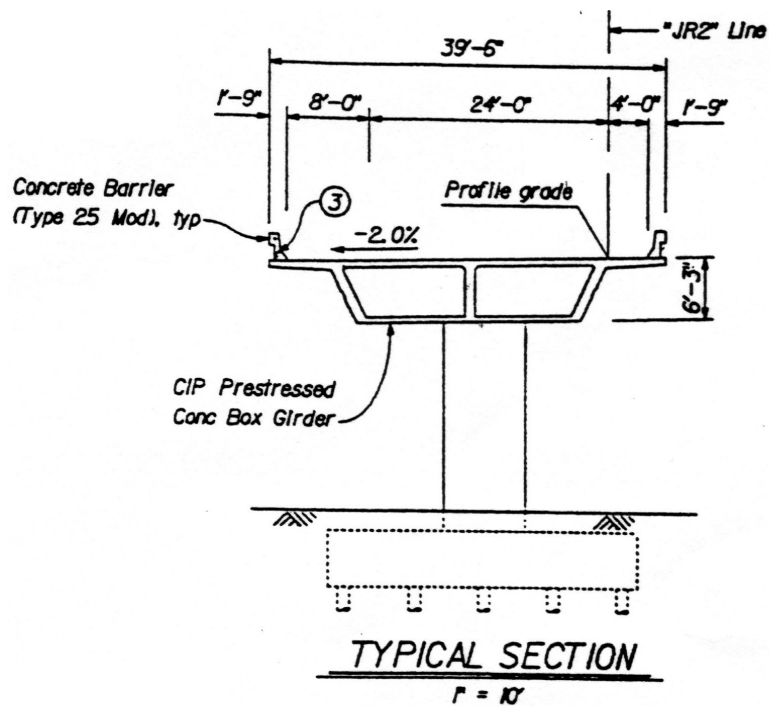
Typical Cross Section of a Box-Girder at Jamboree Road Overcrossing
